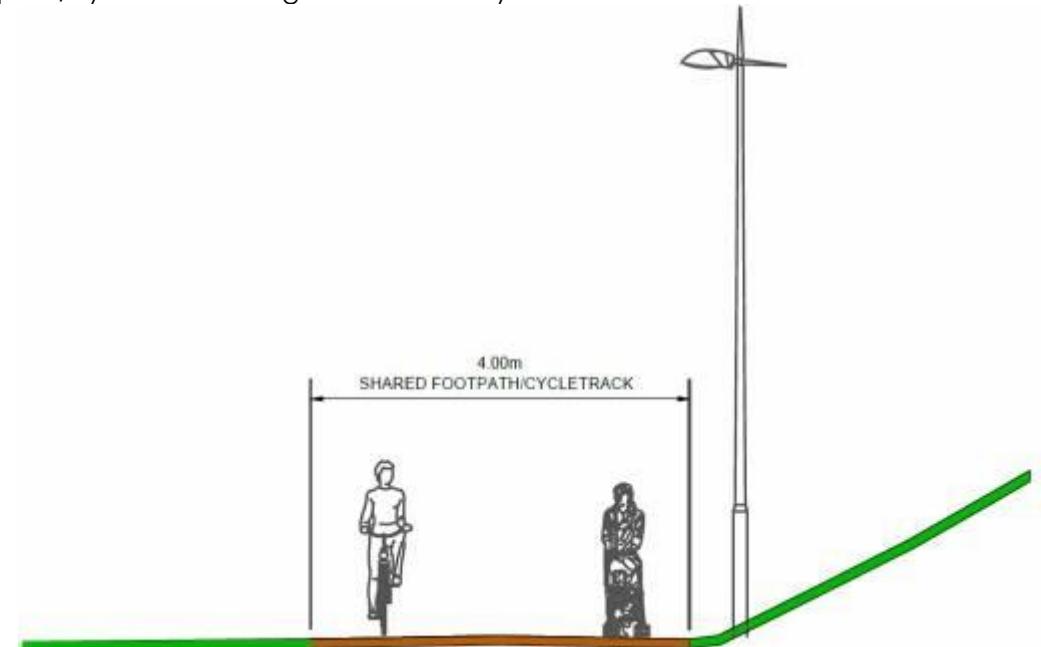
Typical Cross-section through Dodder Valley Park
